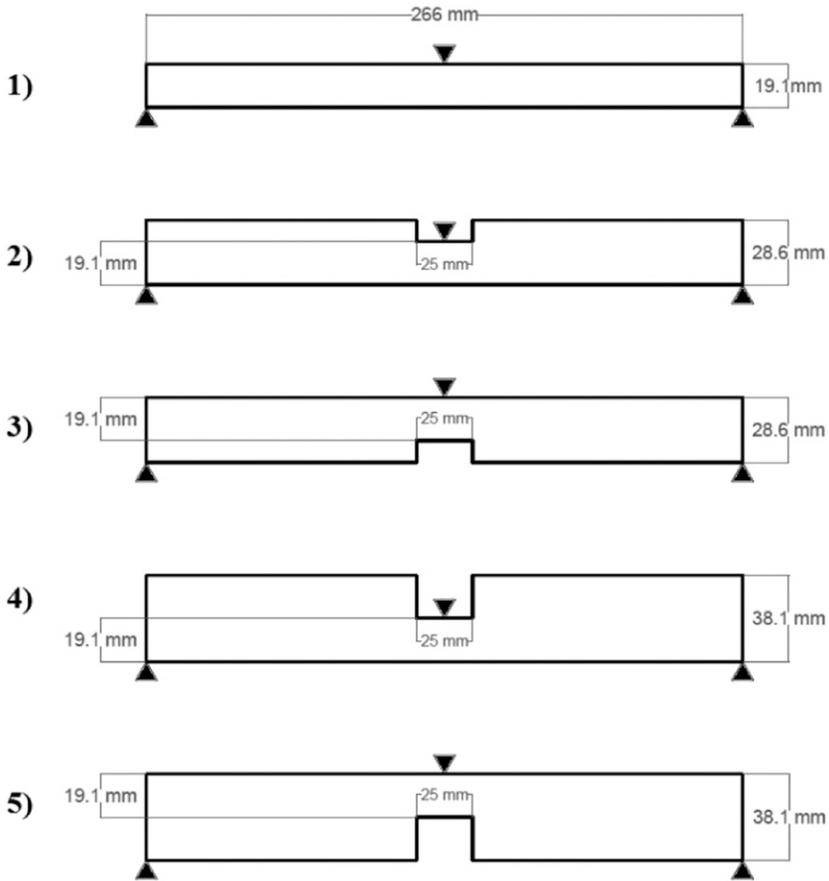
Depiction of the loading schemes on the five beam types. 1 is straight, 2 & 3 are notch to one-third beam depth, and 4 & 5 are notch to one-half beam depth. All beams had a constant width of 38.1 mm.
